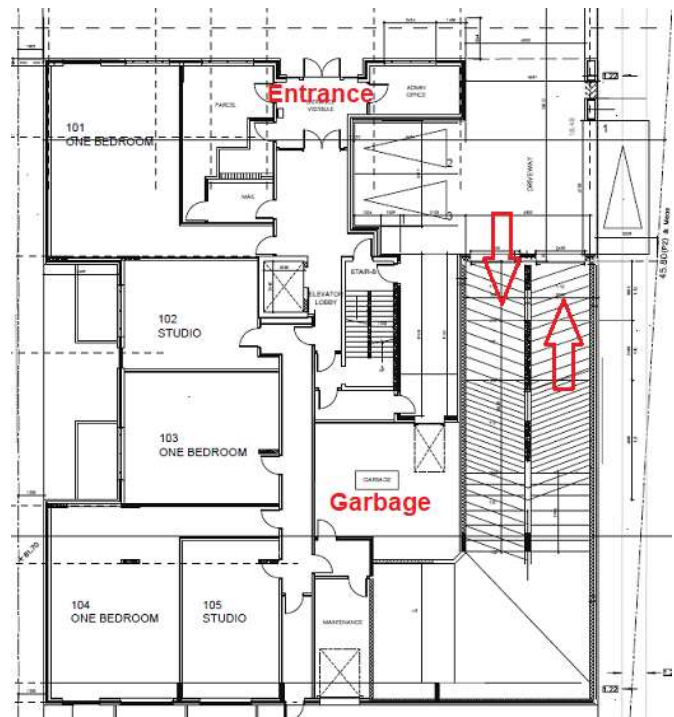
Exhibit R: Proposed ground floor plan with two (2) studios and three (3) 1-bedroom units: red arrows mark the garage ramp
